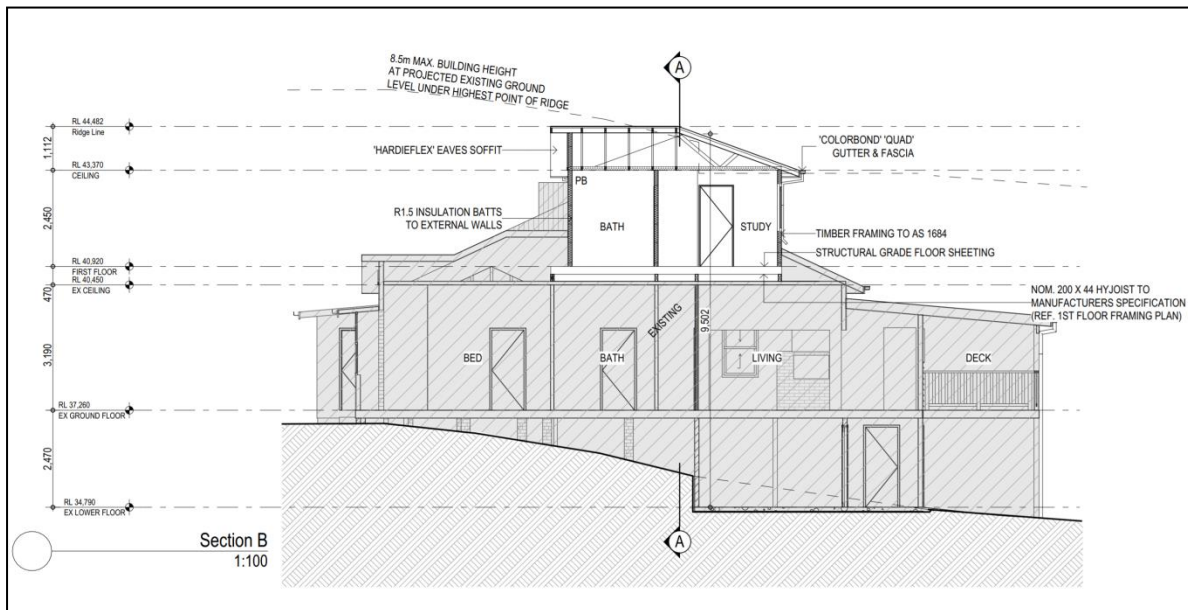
Section plan indicating exceedance to the maximum building height (source: Dwg. No. 1007, Ad-built, 22/09/2021)
